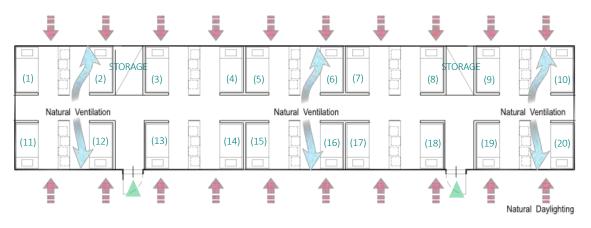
Layout of 20-Bed Room for Skilled Labor
